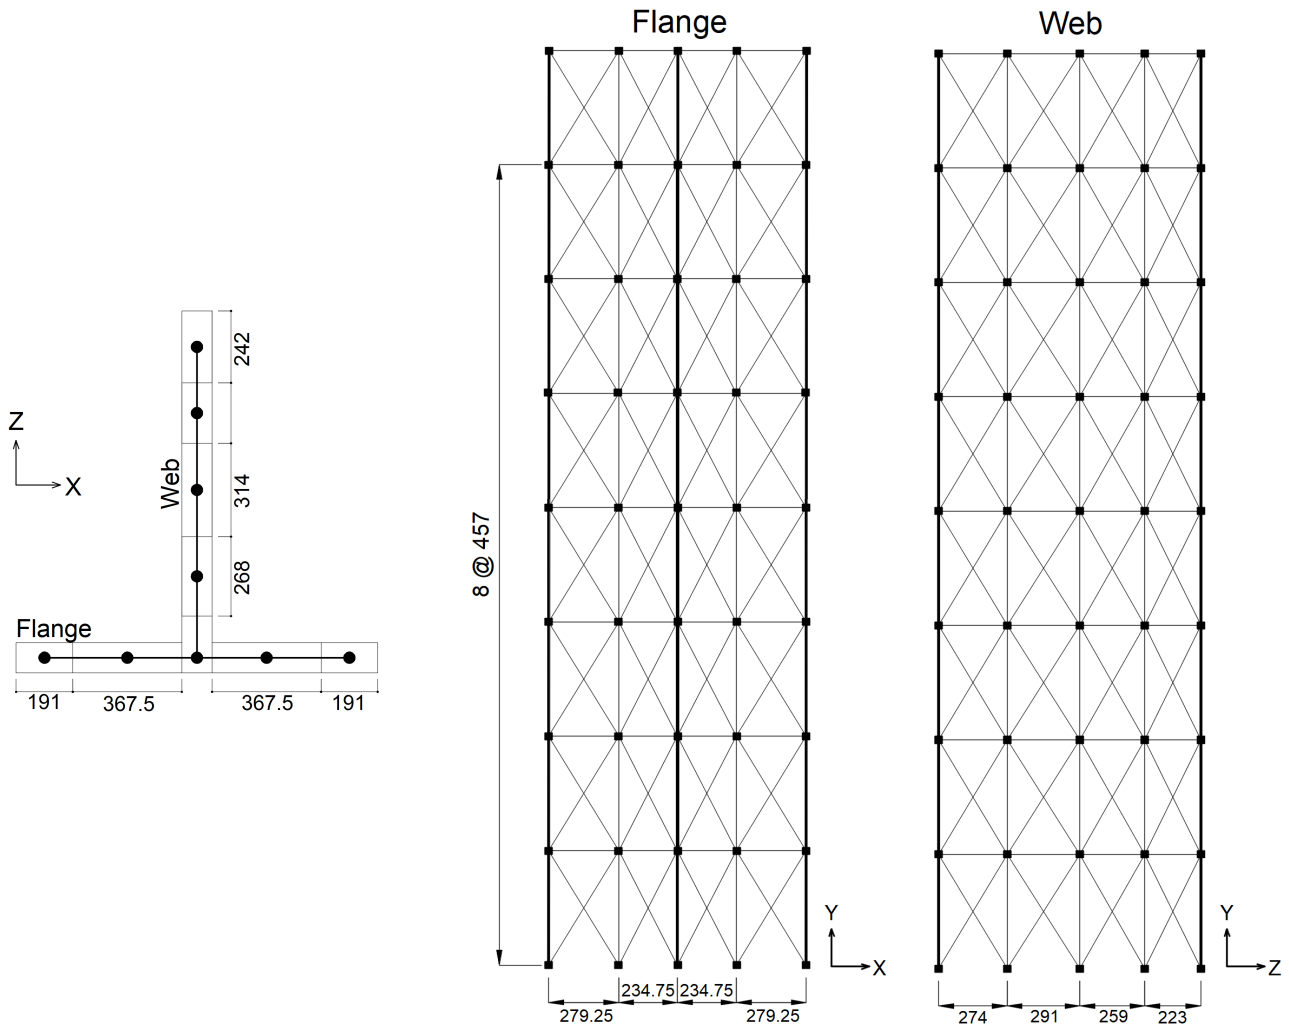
Plan and elevation views of the beam-truss model for TW2 [Unit: mm].
